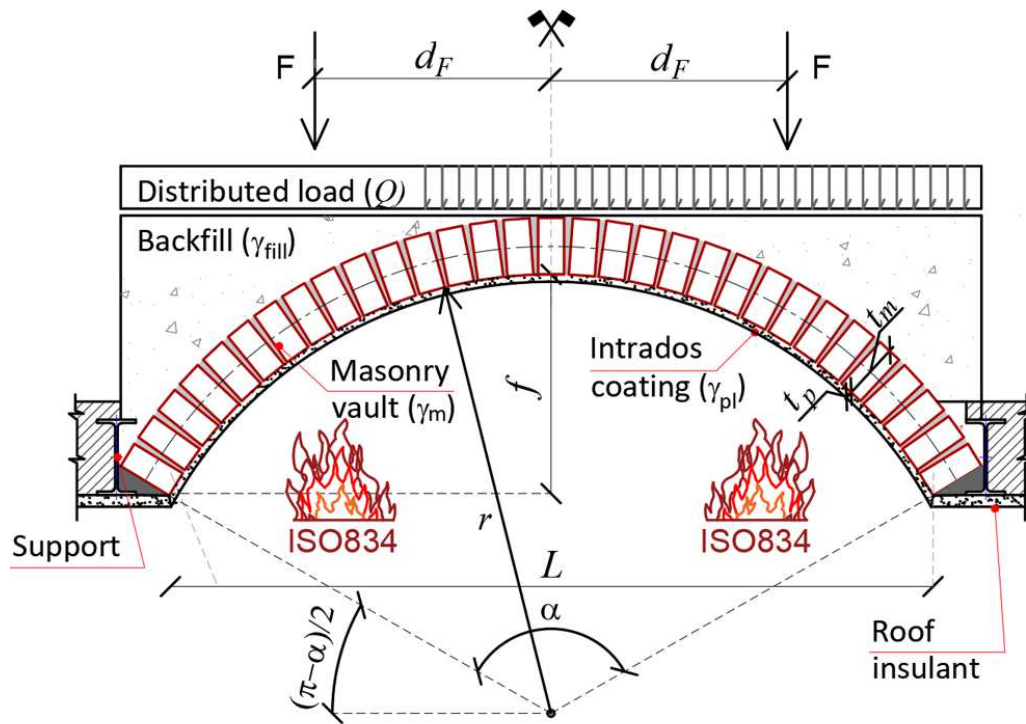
The generic cross-section of a curvilinear masonry vault specimen [135].
